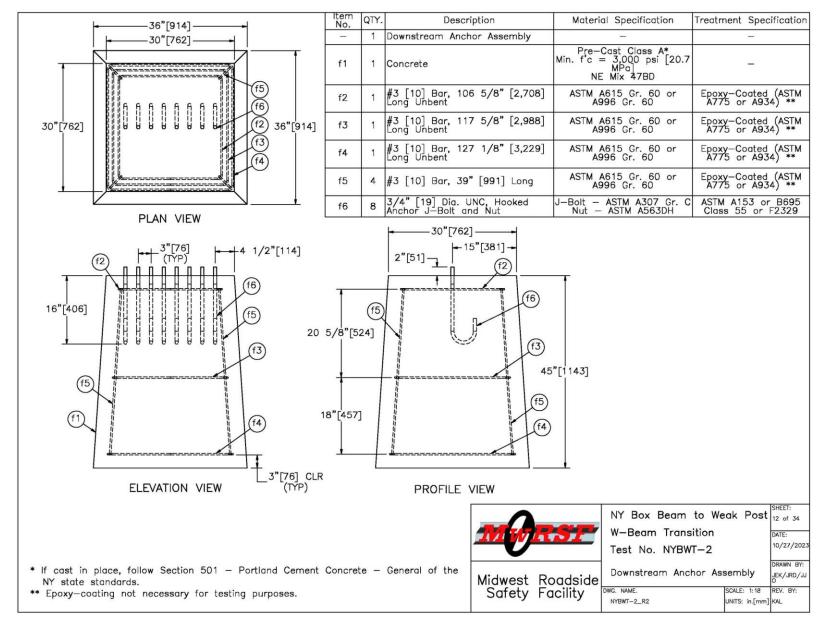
Downstream Anchor Assembly, Test No. NYBWT-2
